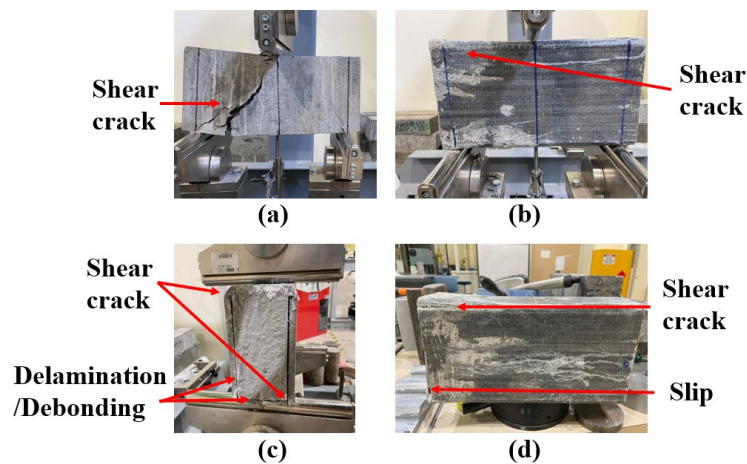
Failure modes of tested beams (a: Reinforced concrete beam; b: Front view of hybrid beam; c: Side view of hybrid beam; d: Back view of hybrid beam).
